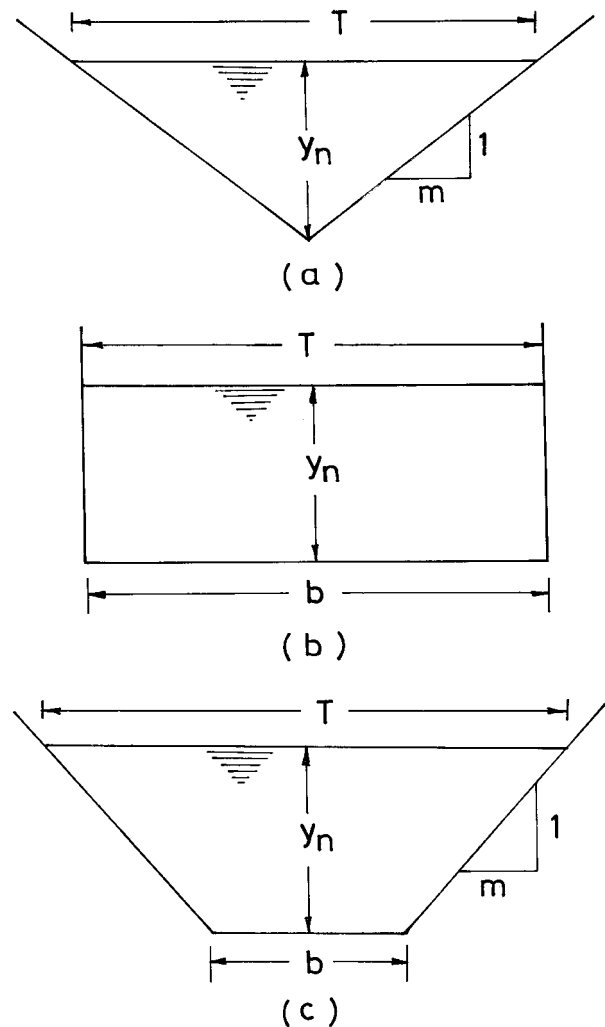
Canal Sections: (a) Triangular Section; (b) Rectangular Section; (c) Trapezoidal Section
